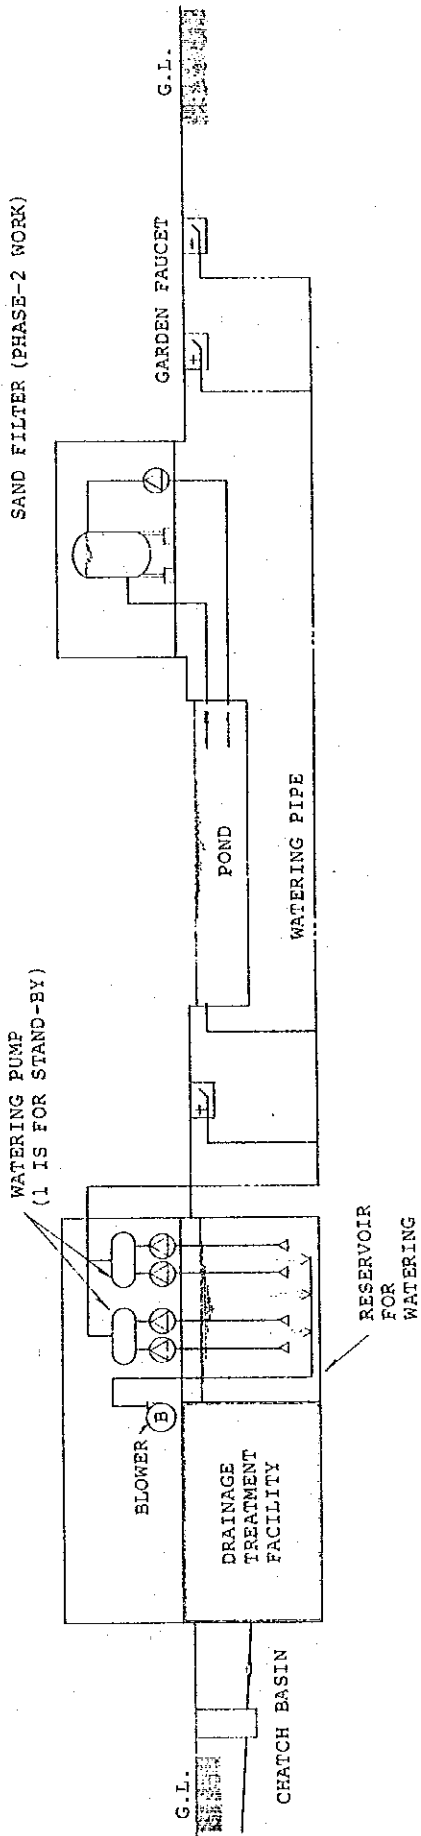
SCHEMATIC PIPING DIAGRAM OF WATERING SYSTEM
